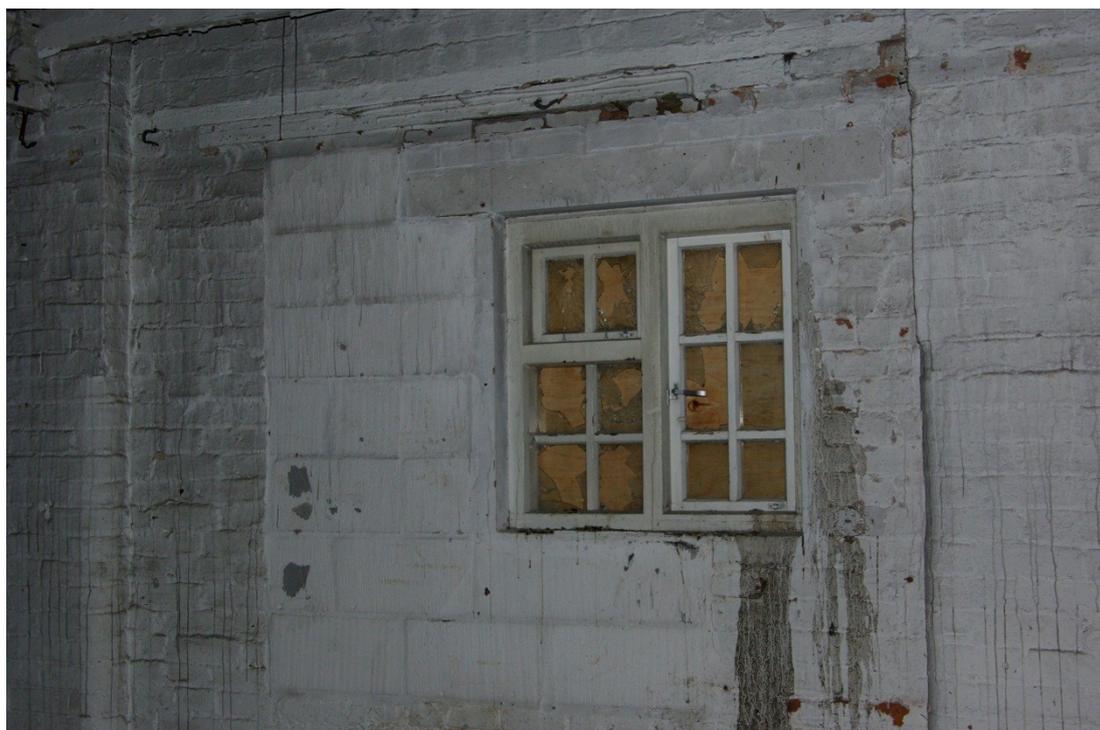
Bath Lane Mill, first floor. Small timber multi-paned window frame inserted within larger, blocked original window opening. Looking west.
